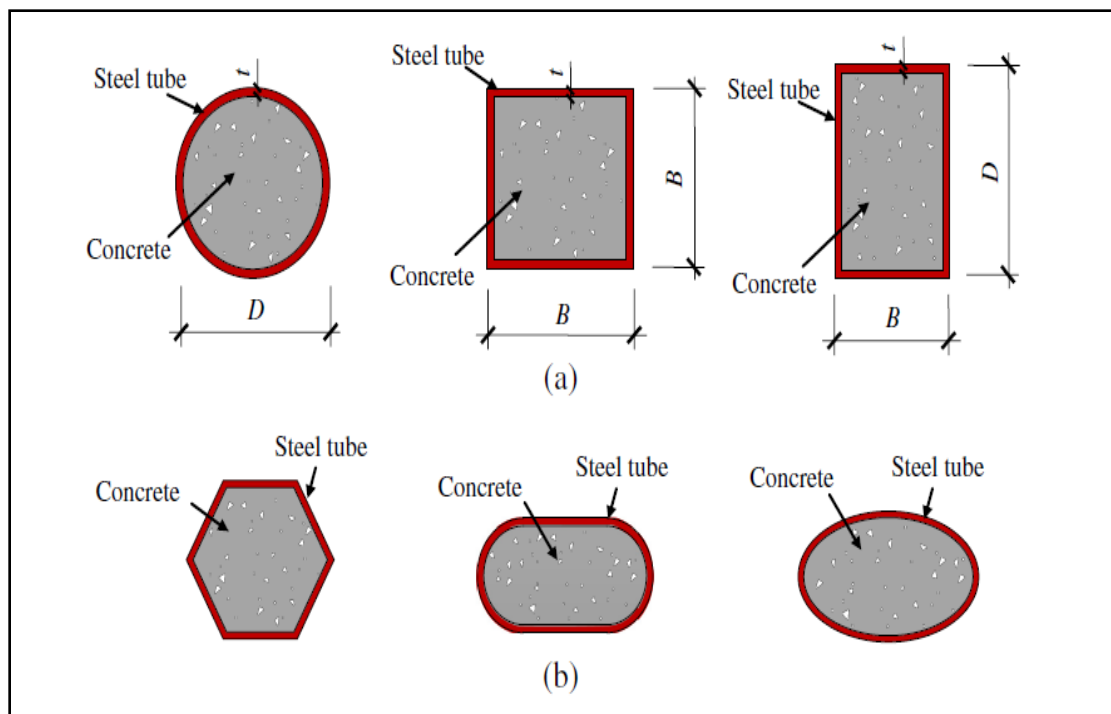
Typical Concrete-Filled Steel Tube Cross Sections (Abdalla, 2012).
